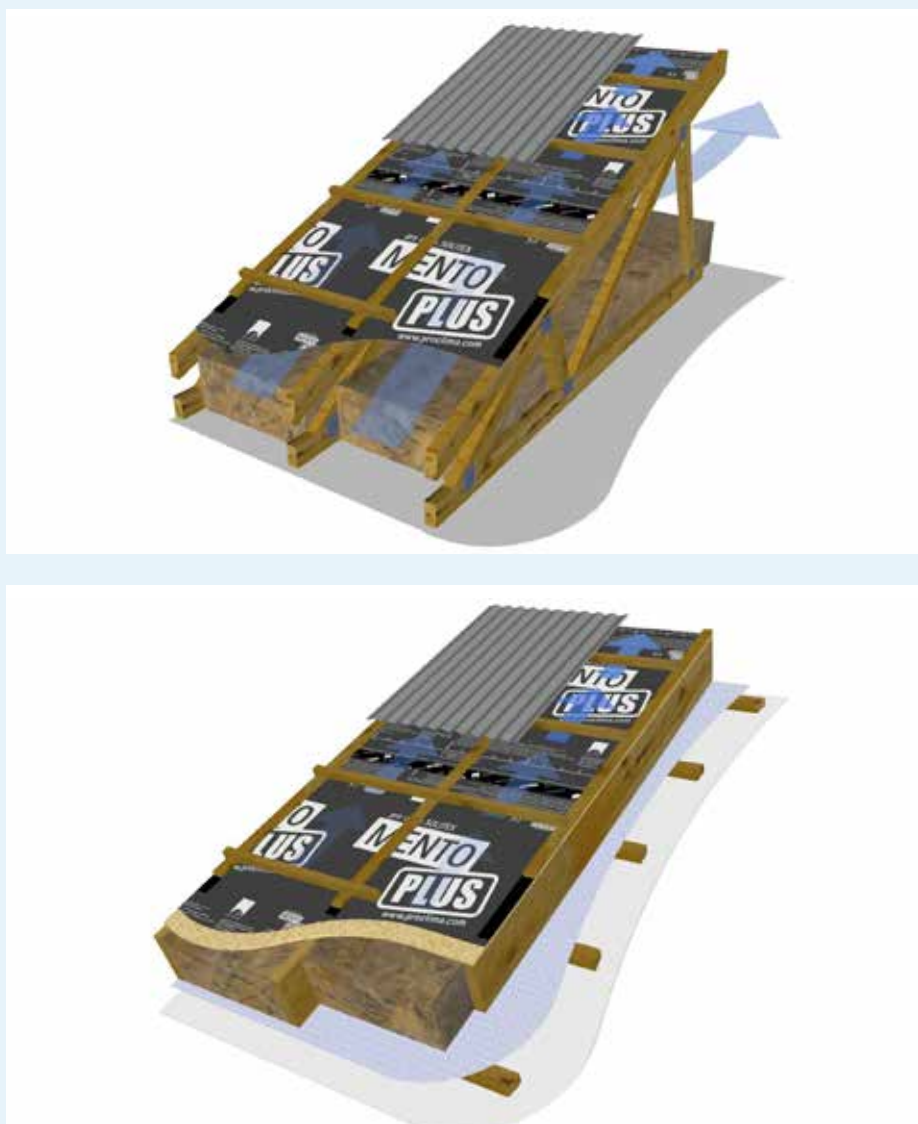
The best place for controlled, contained roof ventilation is between the cladding and the membrane. Large air void on the outside of insulation layers (attics) are best ventilated as well.
